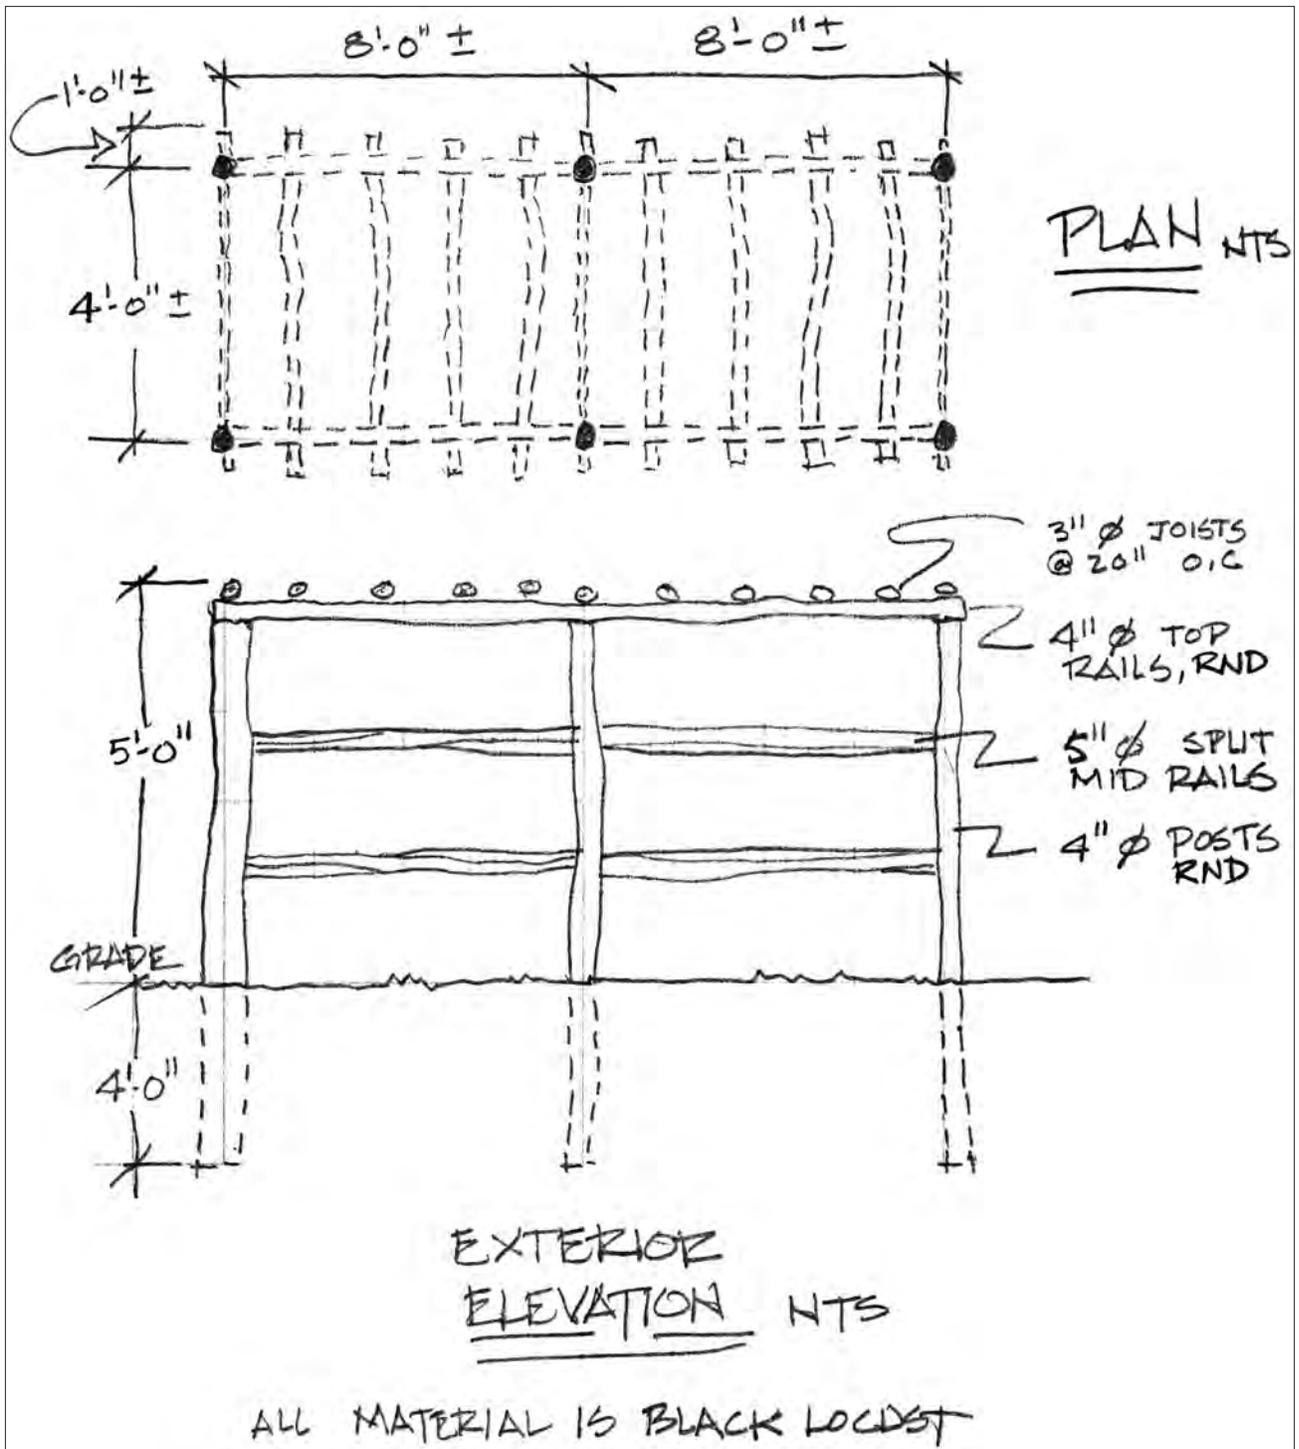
Restored Garden Arbor plan and elevation, 2010 (HPTC).
